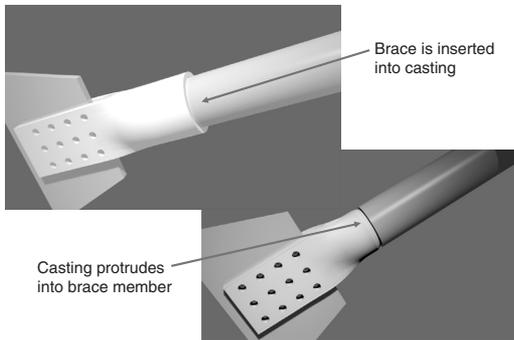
Cast steel connections to tubular braces for seismic load applications.
